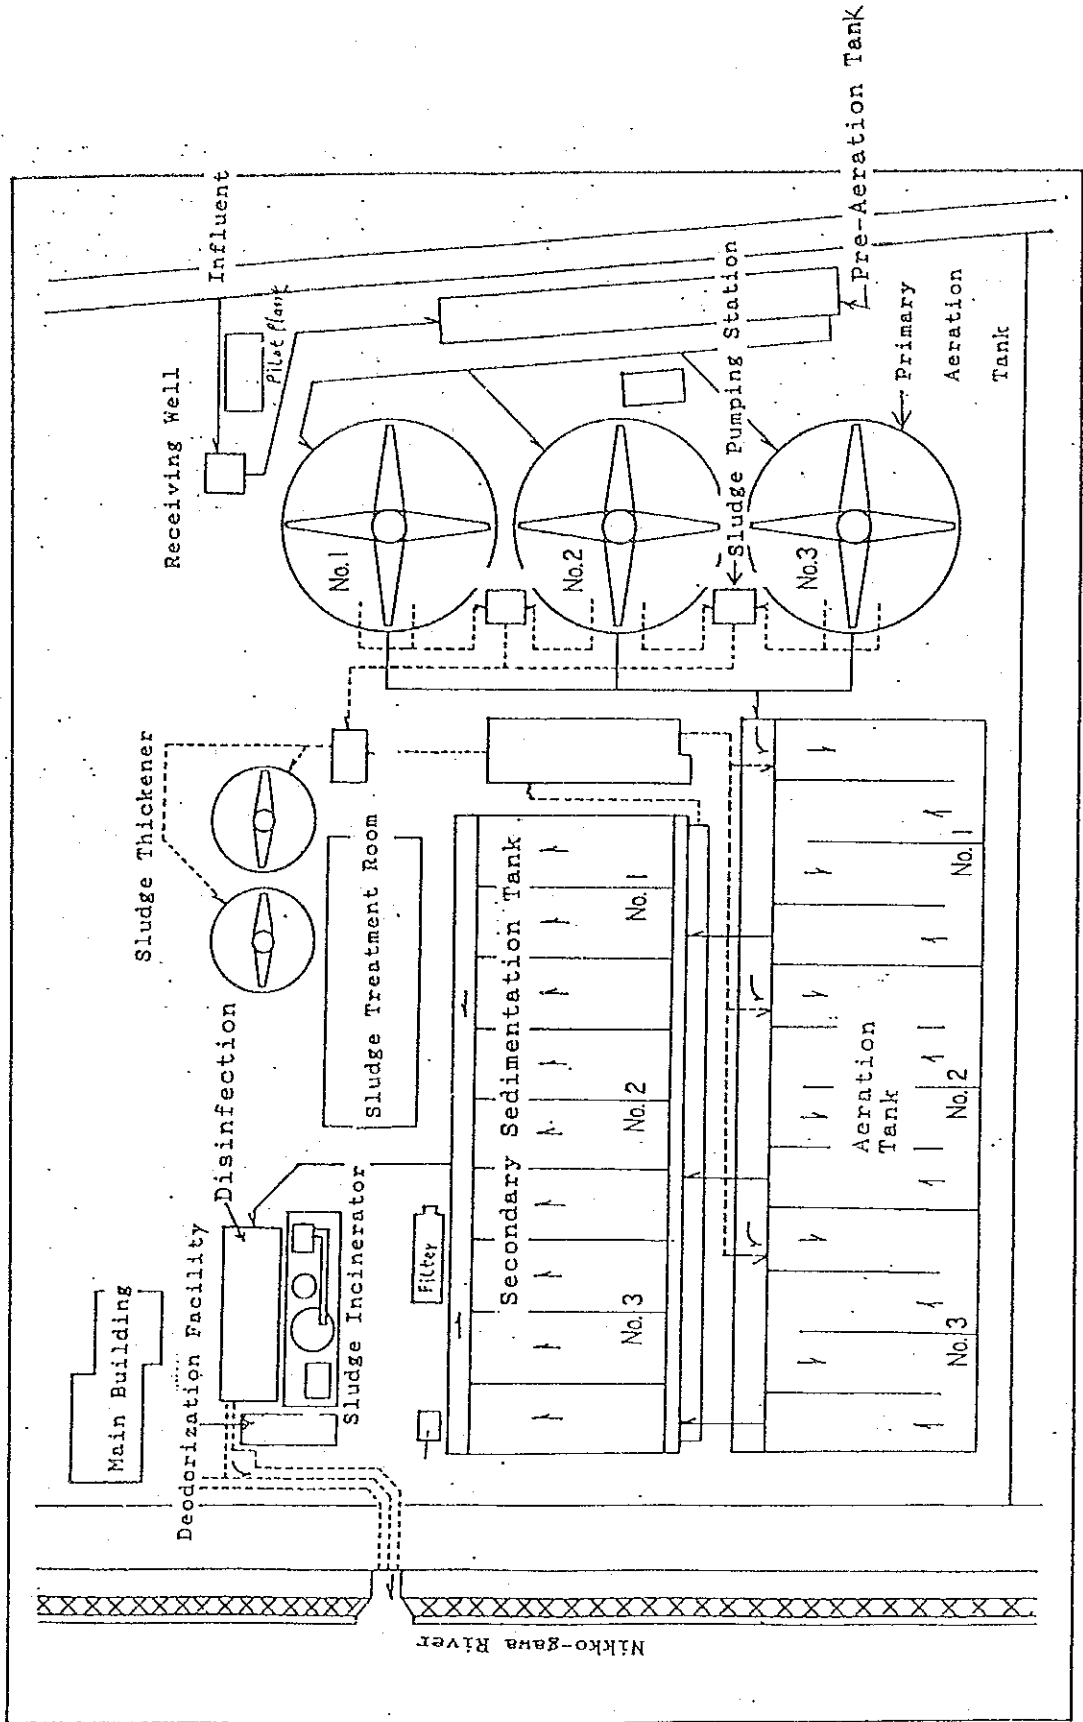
Layout of waste water treatment facilities(Ozai district special public sewage)
